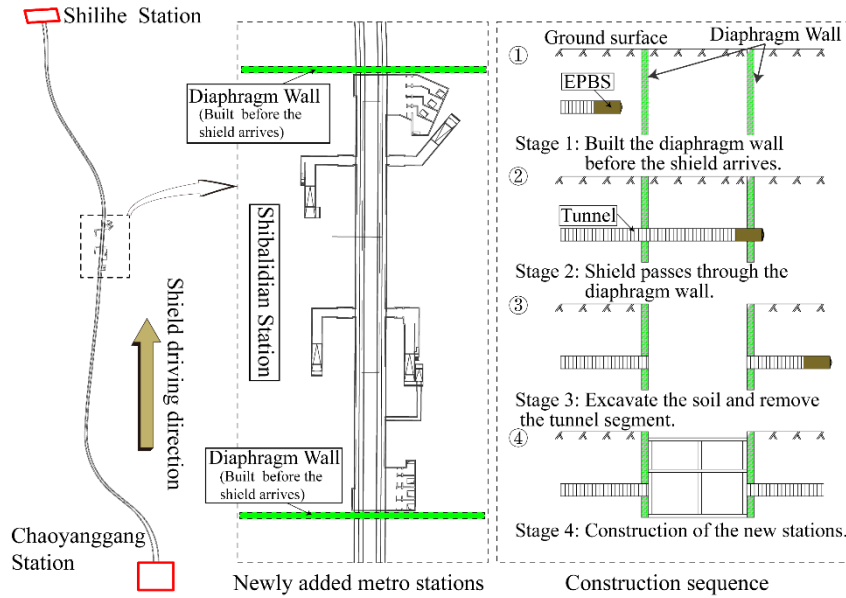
Plan of the tunnel section and construction steps of newly added stations
